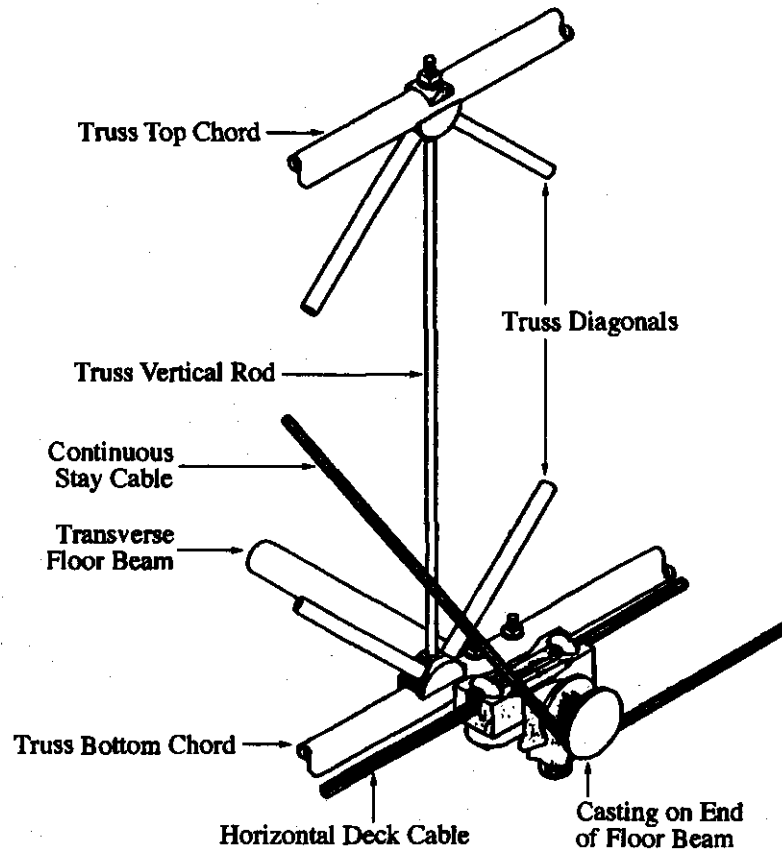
Continuous Stay Cable Connection of the Bluff Dale Bridge
